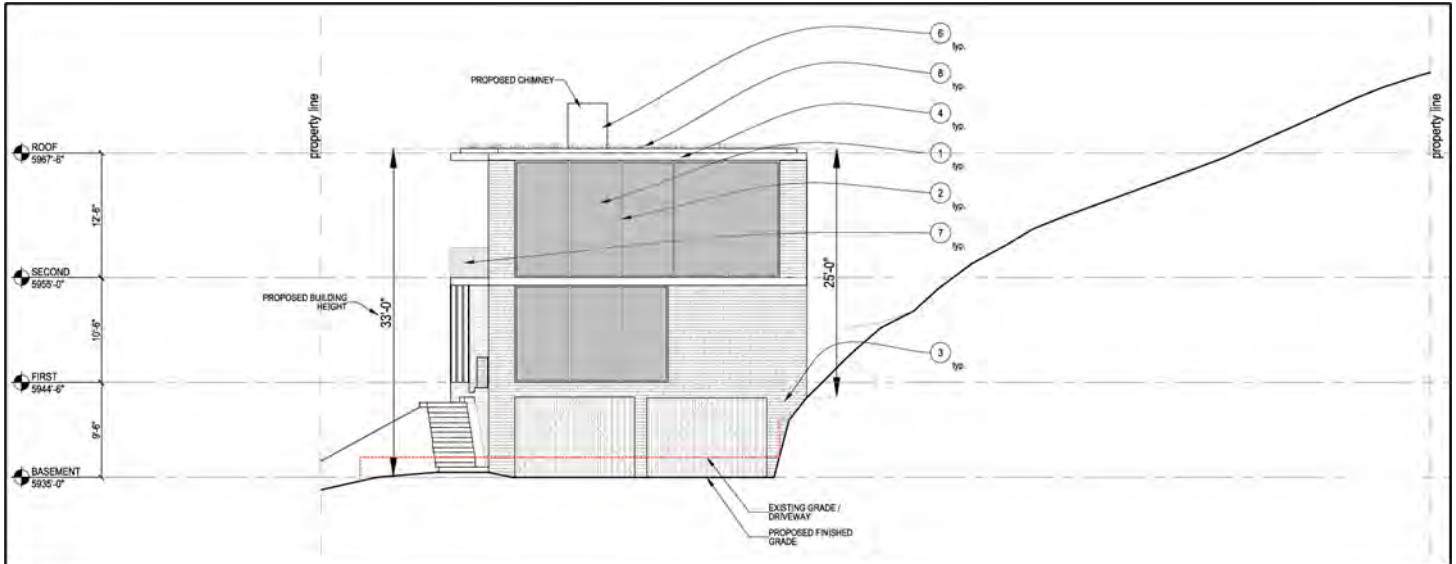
Existing and Proposed Driveway Grade (Sheet A201)
